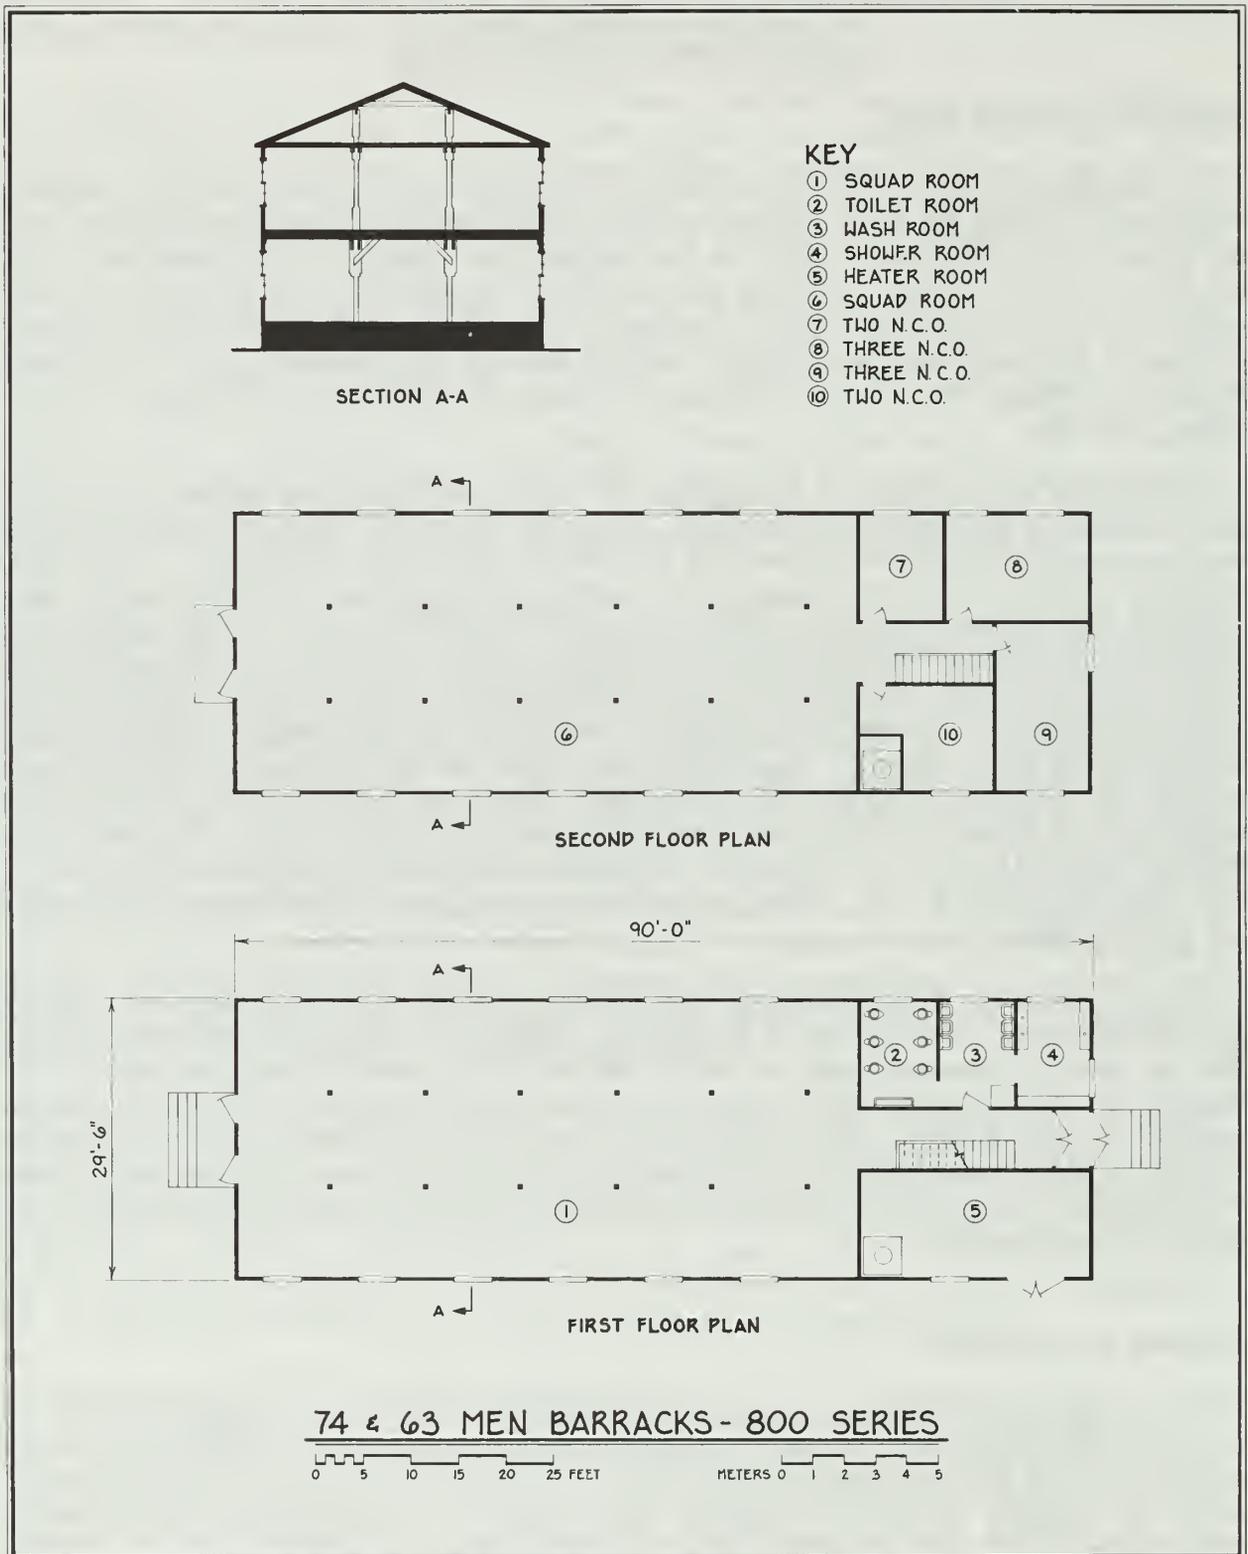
Floor plans of 74 & 63 Men Barracks - 800 Series.
